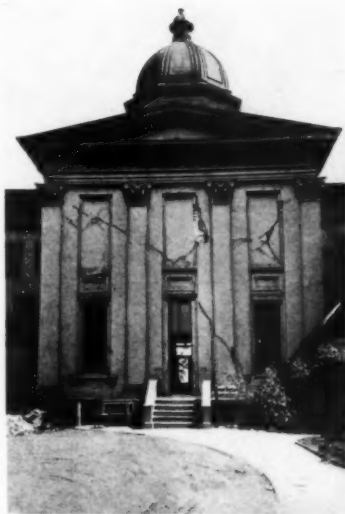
COUNTY COURT HOUSE. SHOWING DIAGONAL FAILURE OF BRICK WALLS
